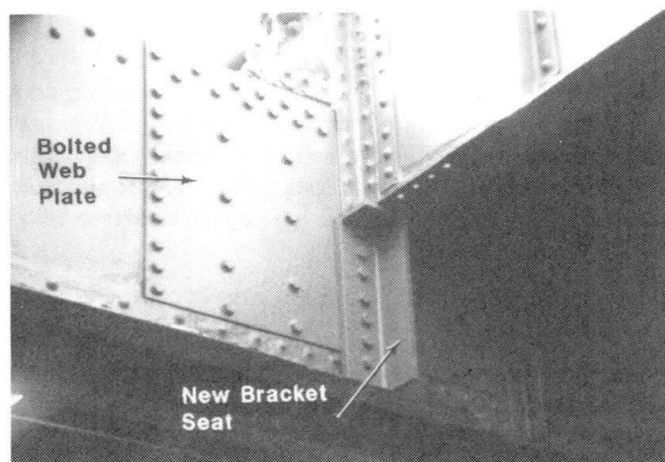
Bolted web and bracket seat repairs using existing and new holes
